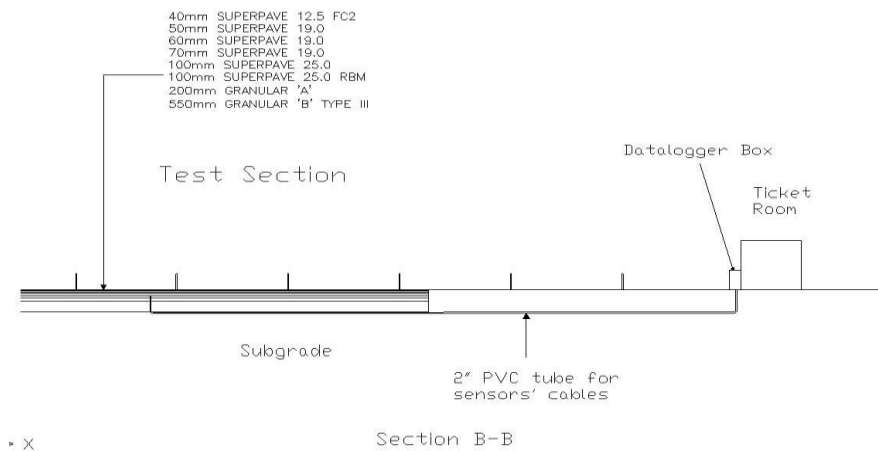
Longitudinal Cross-Section of the Guelph Test Section
